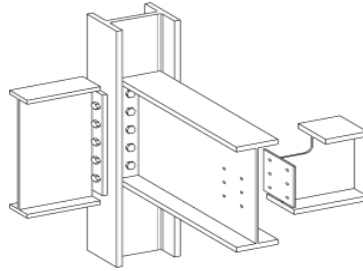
Reuse strategy, End plate beam to column, beam-to-beam connections
